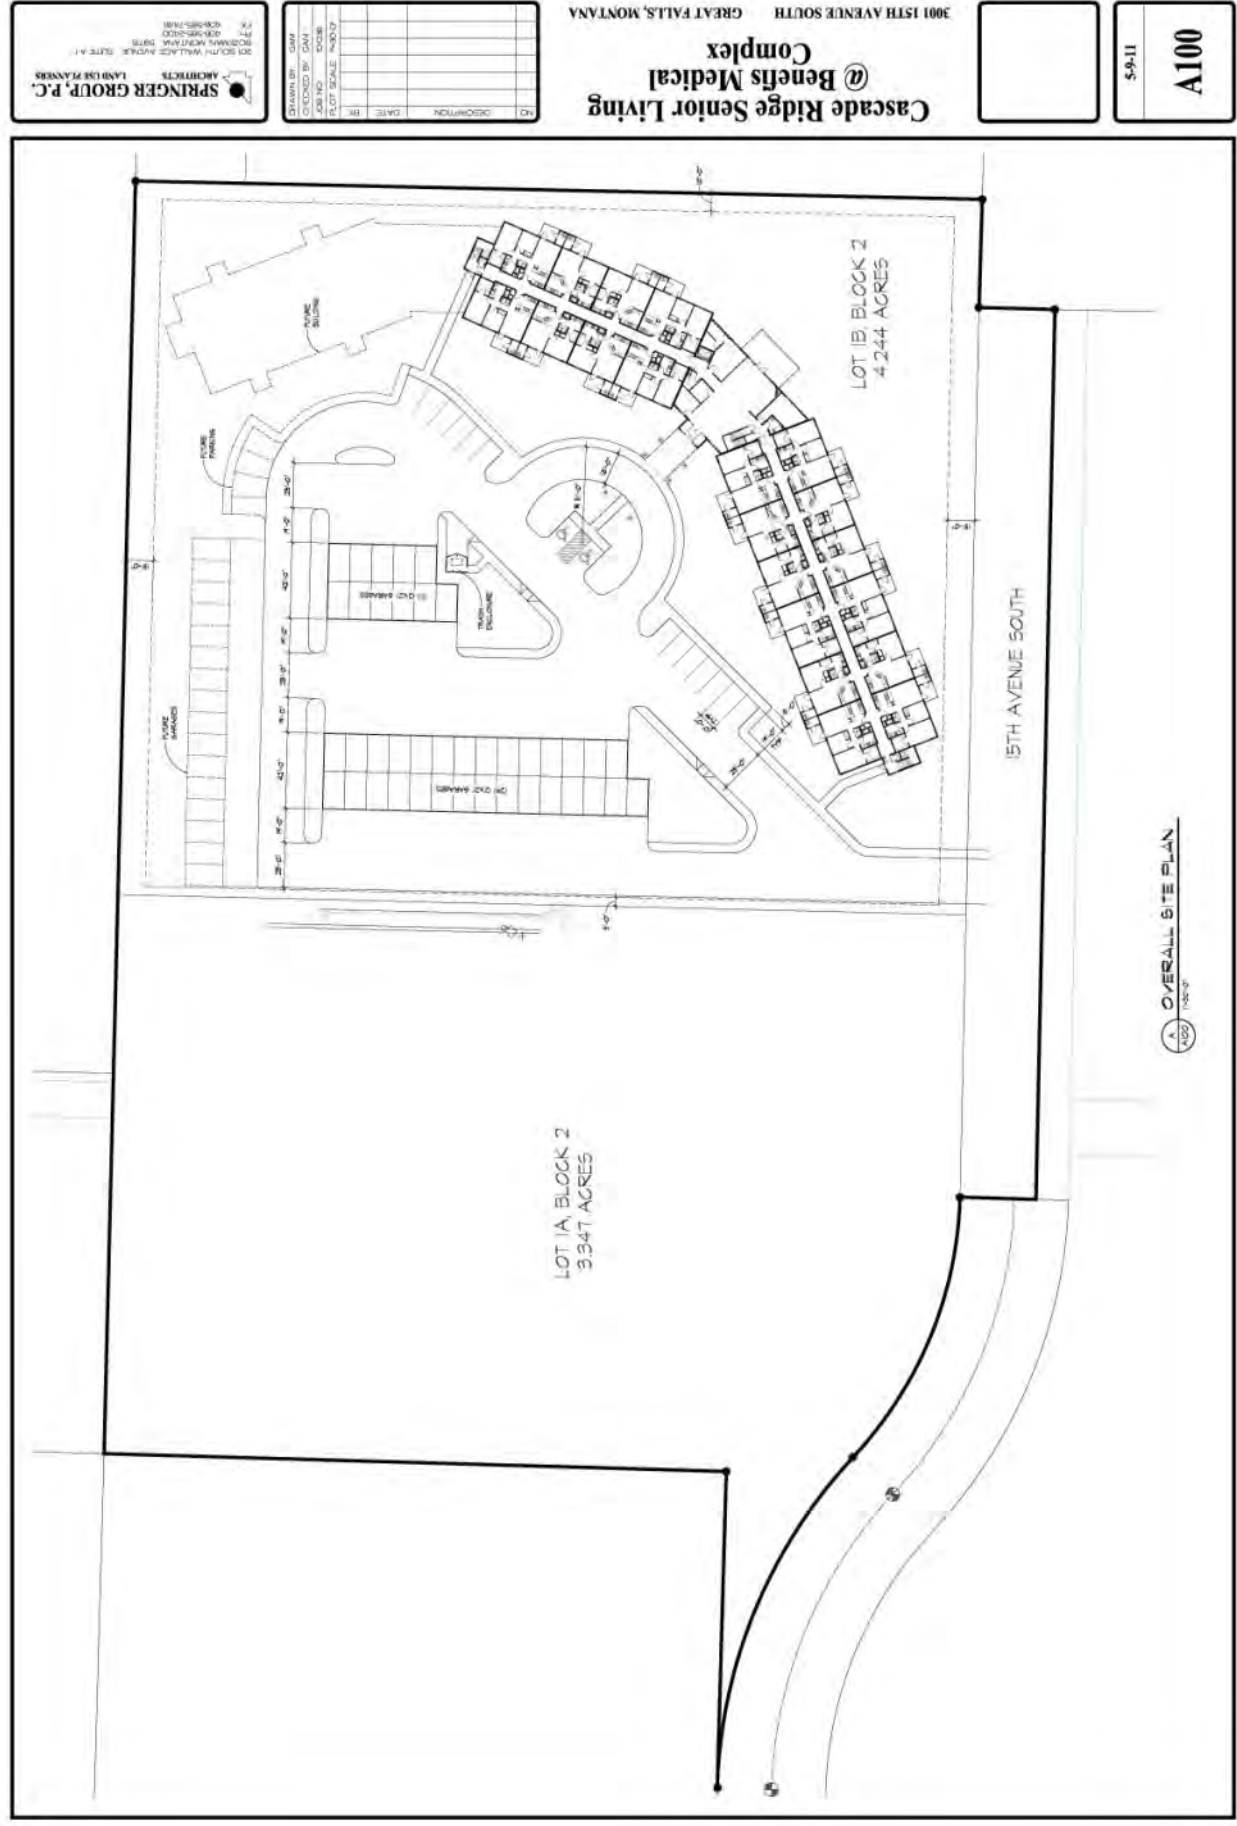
EXHIBIT F - PROPOSED SITE PLAN PHASE 1 RENDERING
